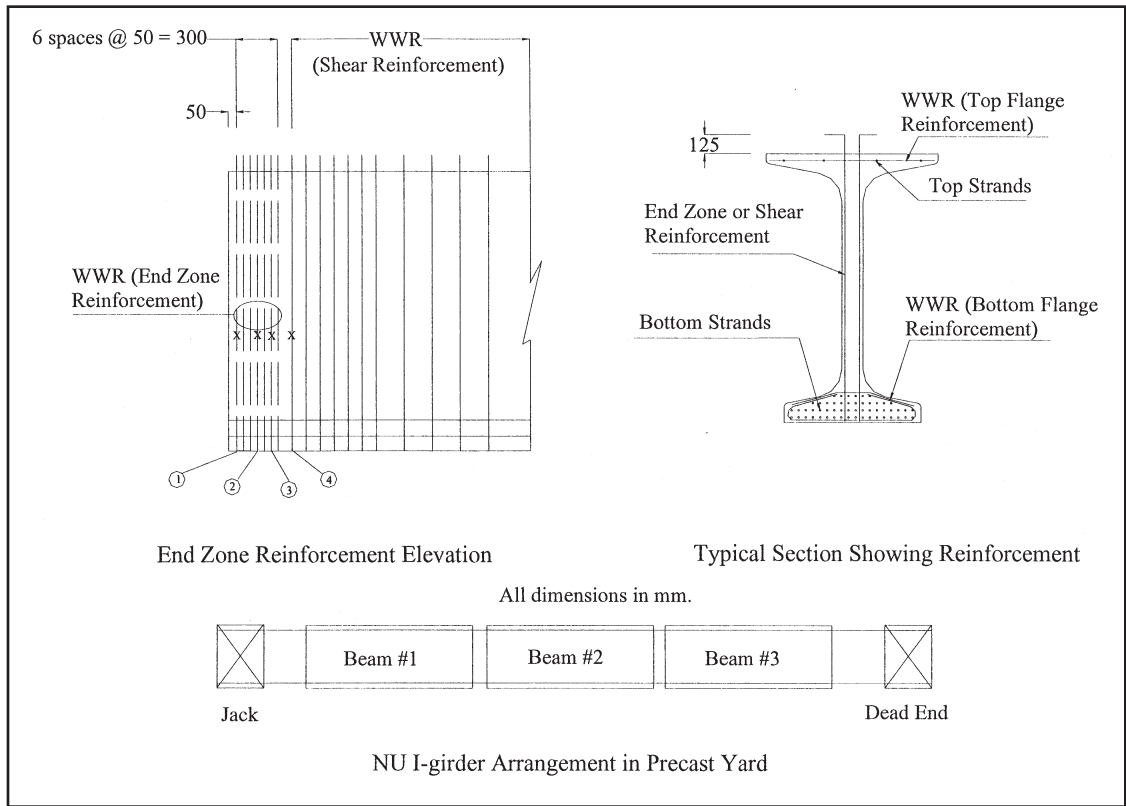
End zone reinforcement detail and strain gauge location-NU1800.
